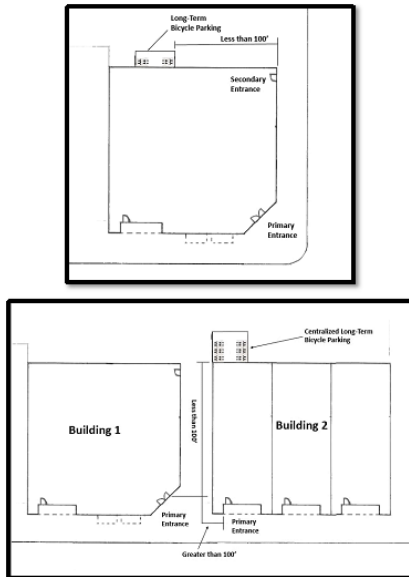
(d)(4): Examples of Long Term Bicycle Parking
